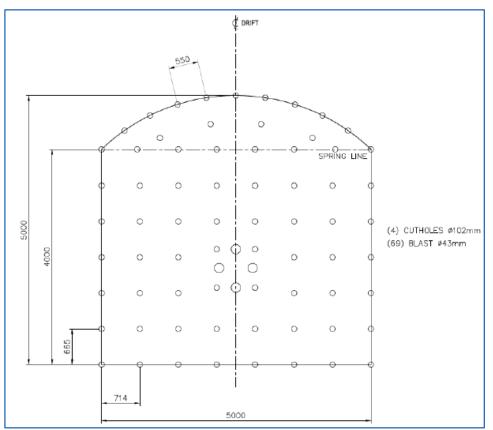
5 x 5 Access Drift – Cross Section Drill Pattern
